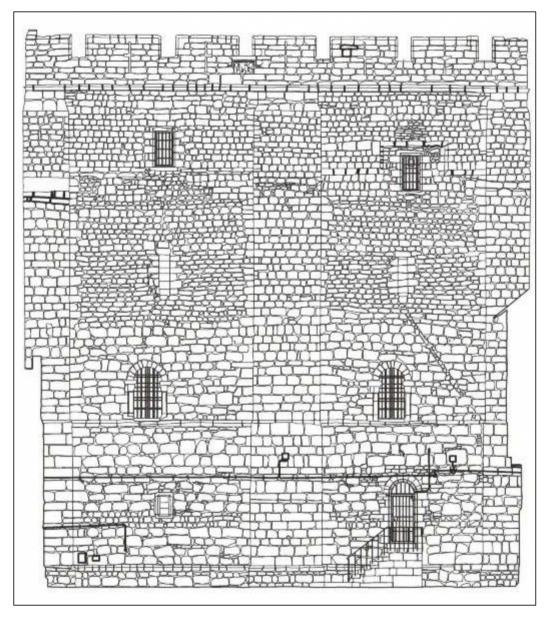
The north façade - bay toward the west. The basement (ground-floor) round-headed door is a relatively modern intervention. Above there is a blocked rectangular narrow second-floor window and an inserted third-floor grilled window which possibly replaced a corbelled out garderobe. The scars in the stonework that run gable-like from below the blocked window to the string-course are the marks of a C19 building's gable-end roof (the Day-Room) that once stood in the courtyard.
